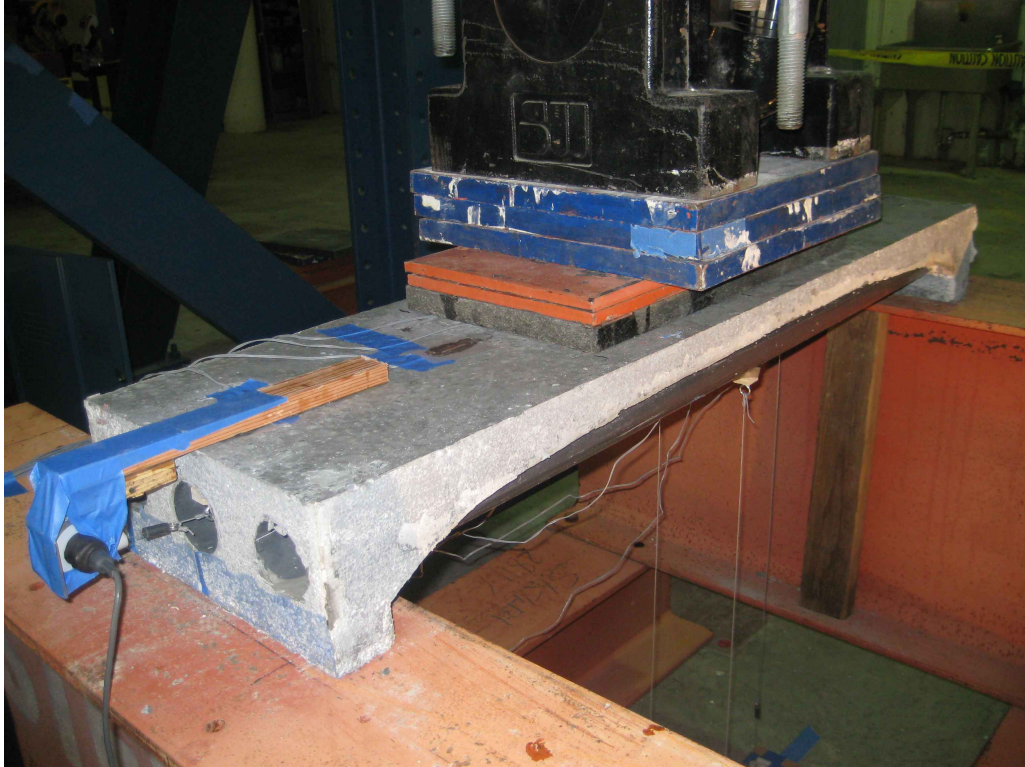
Test Setup for the Tapered Section Ductal®-FRP Deck Specimen
